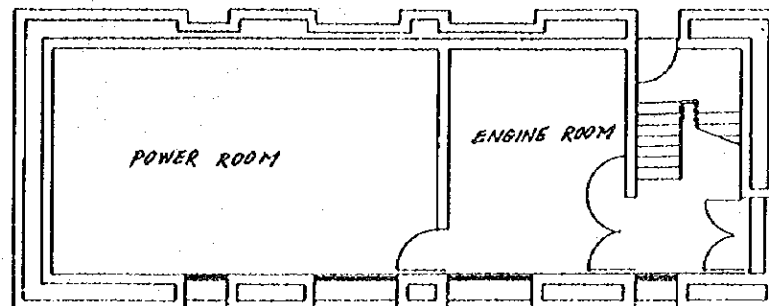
Plan (1st Story) of Type D Radio Repeater Station
